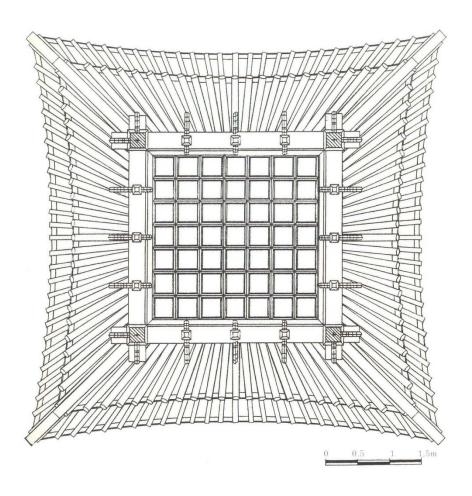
Nungsujung Ceiling Plan (N. Zu 2003)
